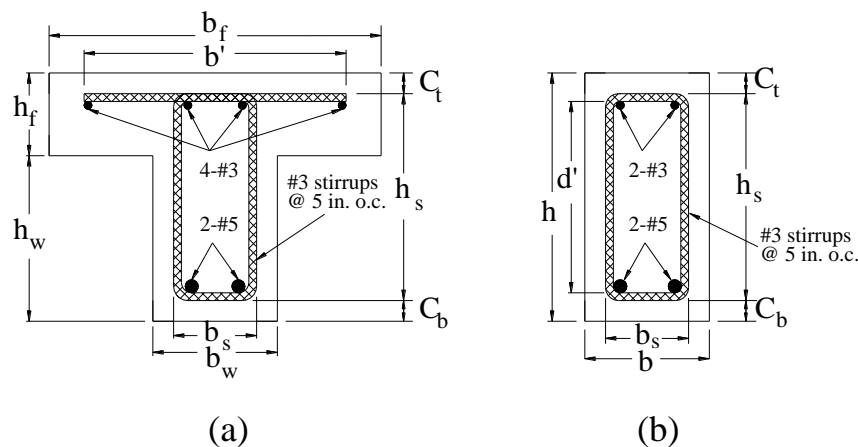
Beam Specimen Cross-Section (a) T-Beam (b) Rectangular Beam
